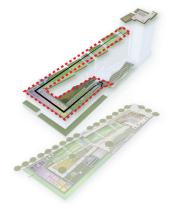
Via Verde- The stepped roof levels forming multiple outdoor spaces
